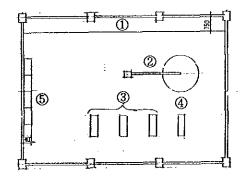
NAUTICAL EQUIPMENT MODEL ROOM PLAN
